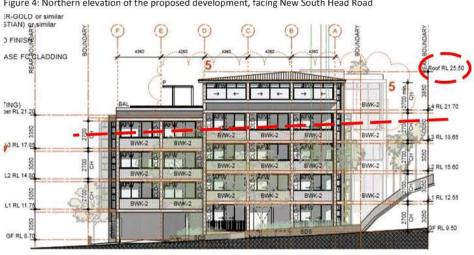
Northern elevation of the proposed development, facing New South Head Road
